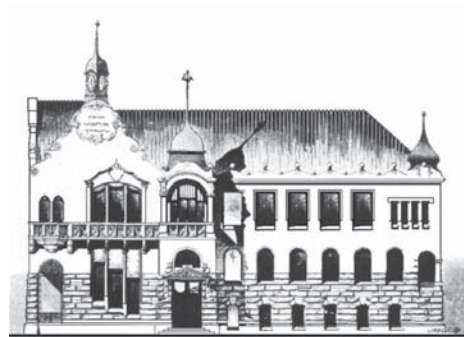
Design of National Savings Bank building in Rzeszów by H. Stifelman and S. Weiss, the front elevation [Architekt 1906, 12]
